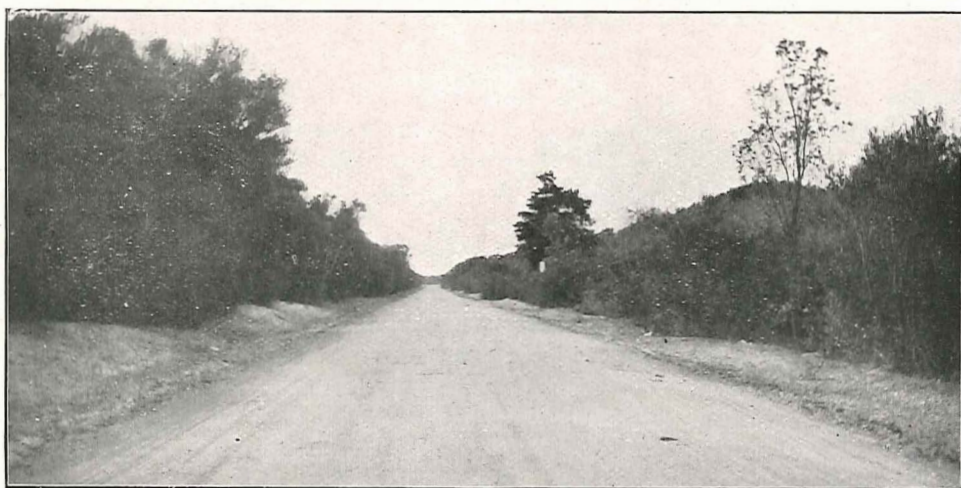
Showing excellent road surface of Macadam obtained by efficient rolling with steam roller, Shire of Frankston and Hastings.
